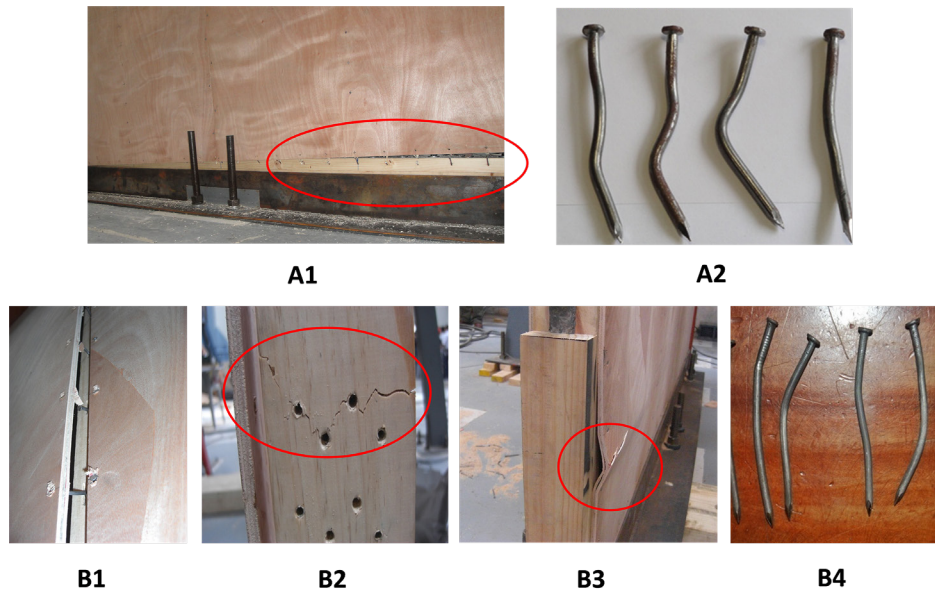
Typical failure modes. A1: Nail bending and end stud uplift. A2: Deformed nails in type A specimens. B1: Panel withdrawal. B2: End stud failing in tension. B3: Panel buckling. B4: Deformed nails in type B specimens.
